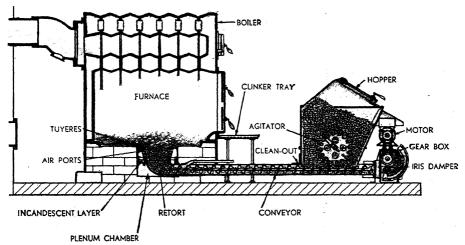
LAYOUT FOR AUTOMATIC STOKER FIRING OF SECTIONAL BOILER
